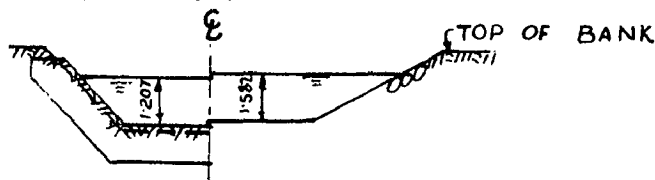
TYPICAL DESIGN OF AN OUTLET TRANSITION
